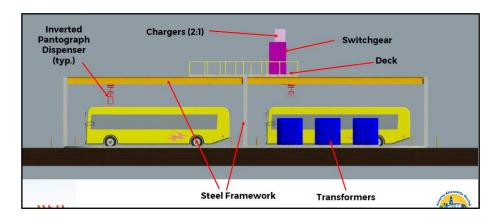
shows the west elevation of the proposed bus parking expansion.
